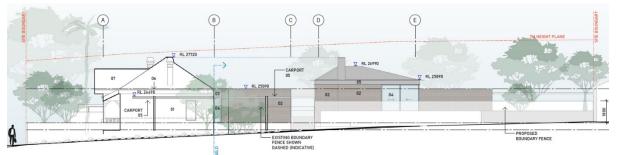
Northern side elevation of proposed development demonstrating profile and shape of roof over rear pavilion extension (shown in grey).
